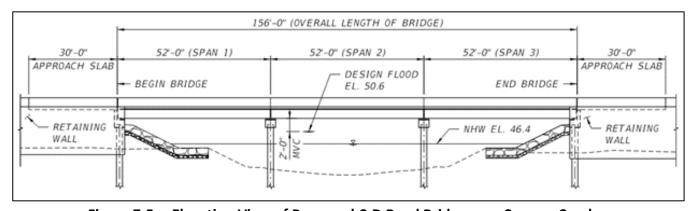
Elevation View of Proposed C-D Road Bridge over Cypress Creek
